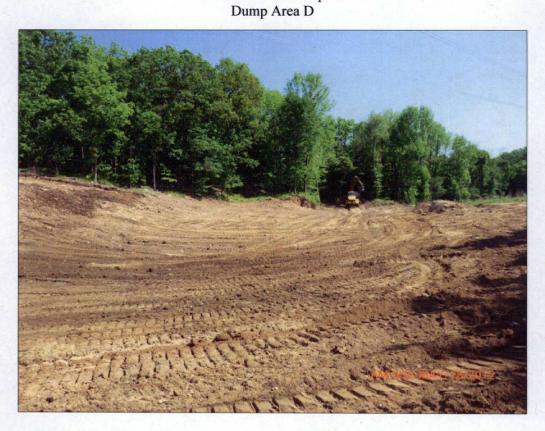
A general view of Dump Area D backfilling and grading, taken on 5/11/12 at 1055 hrs.
